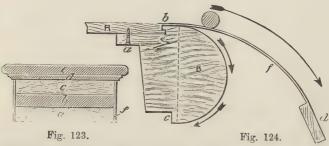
Section through Step. Fig. 124.—Bending Riser round Block.
